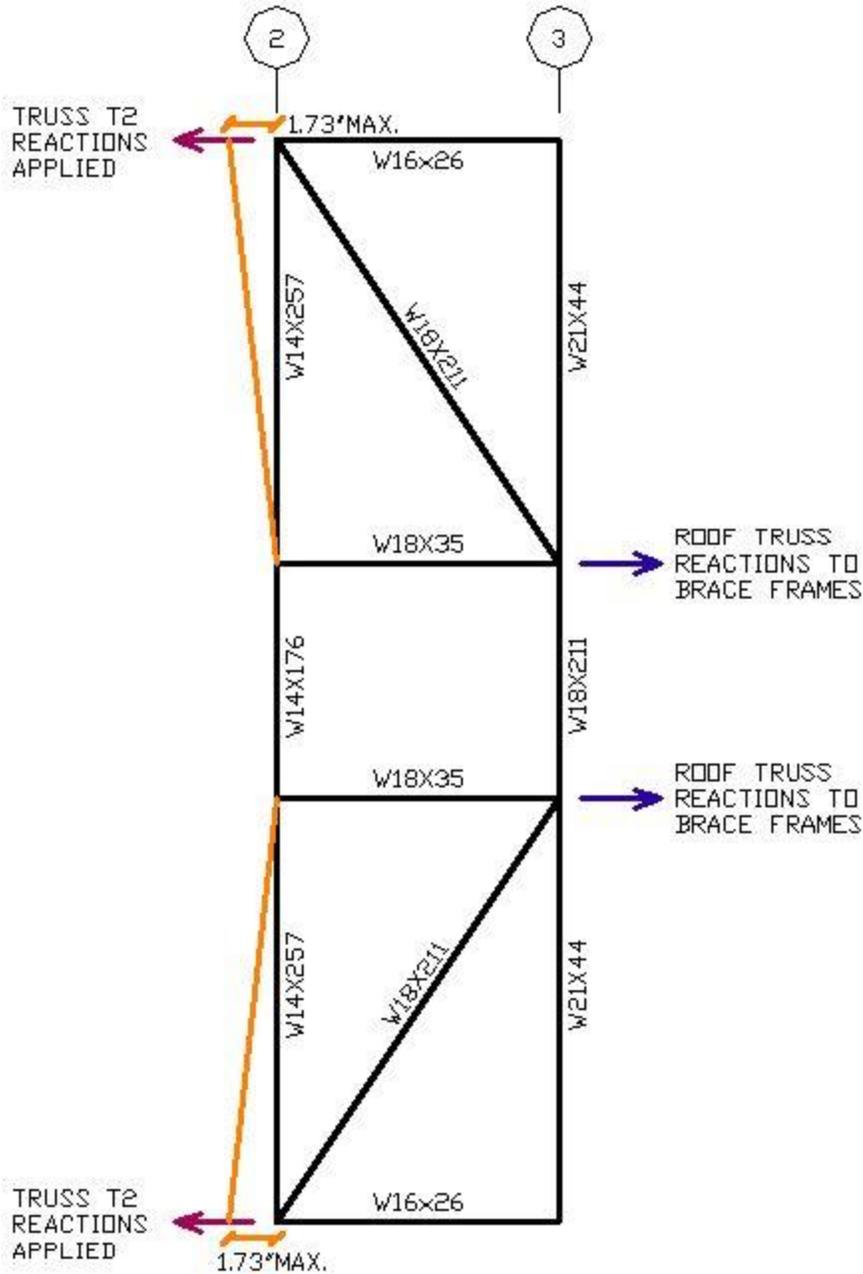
Line Drawing of Redesigned Roof Truss Showing Loads, Reactions, and Deflections
